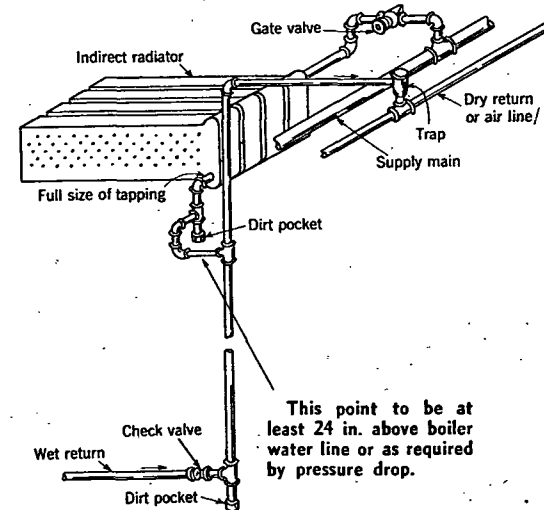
TYPICAL PIPING CONNECTIONS TO CONCEALED HEATING UNITS WITH WET RETURNS
